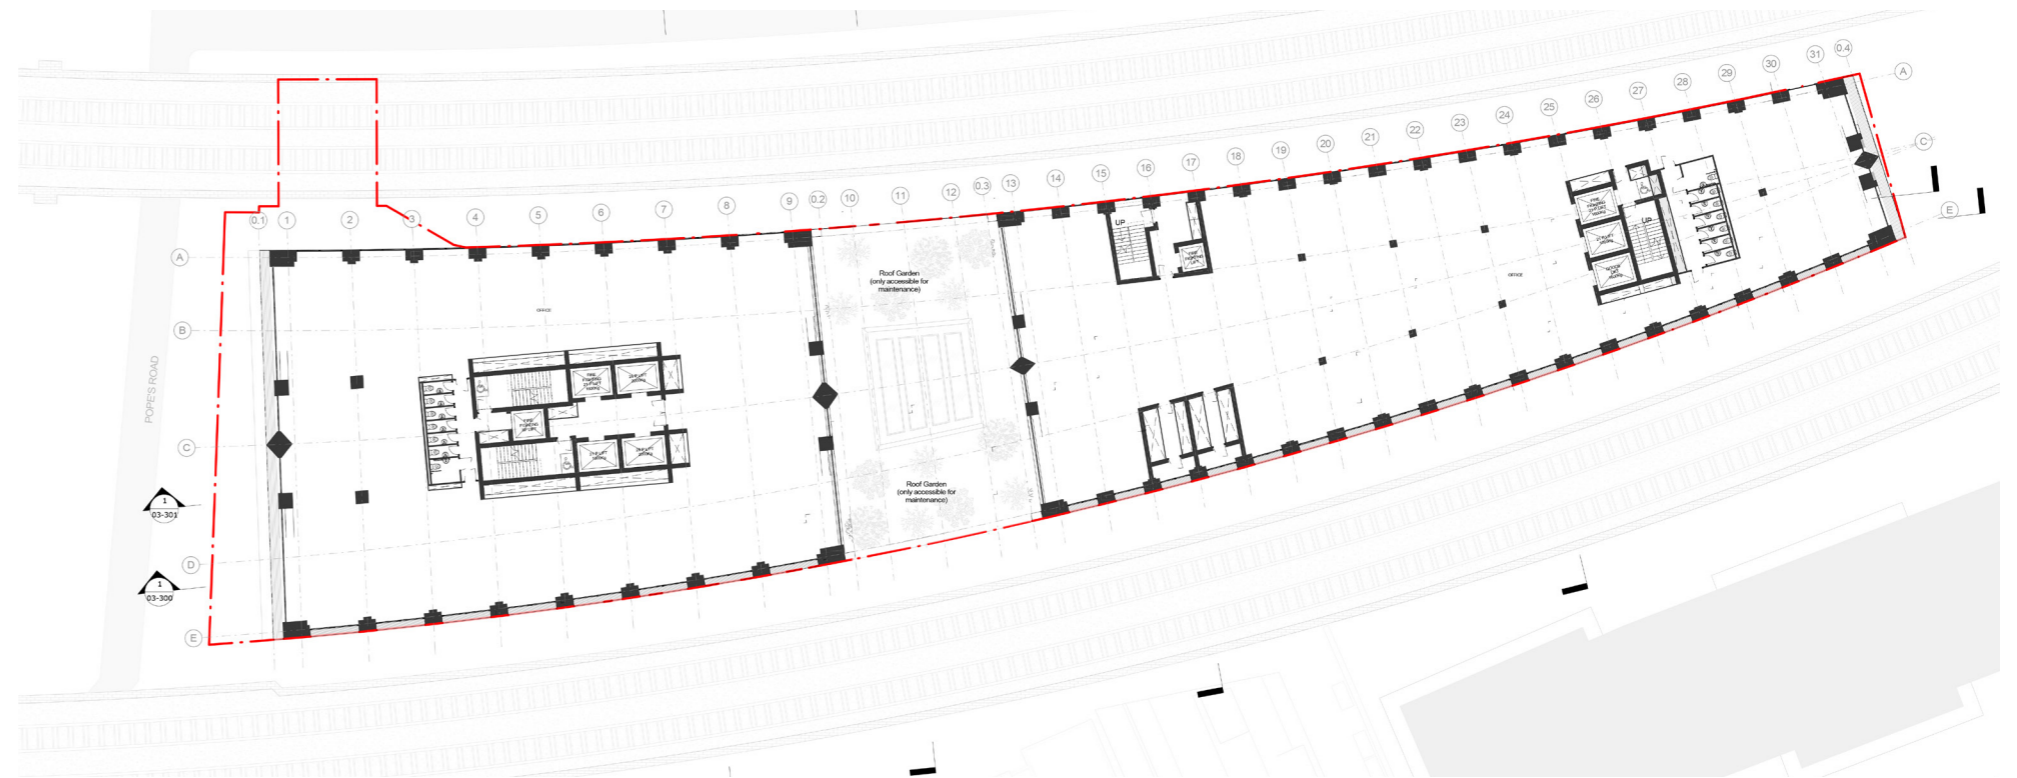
July 2020 Planning Addendum typical office floor plan
